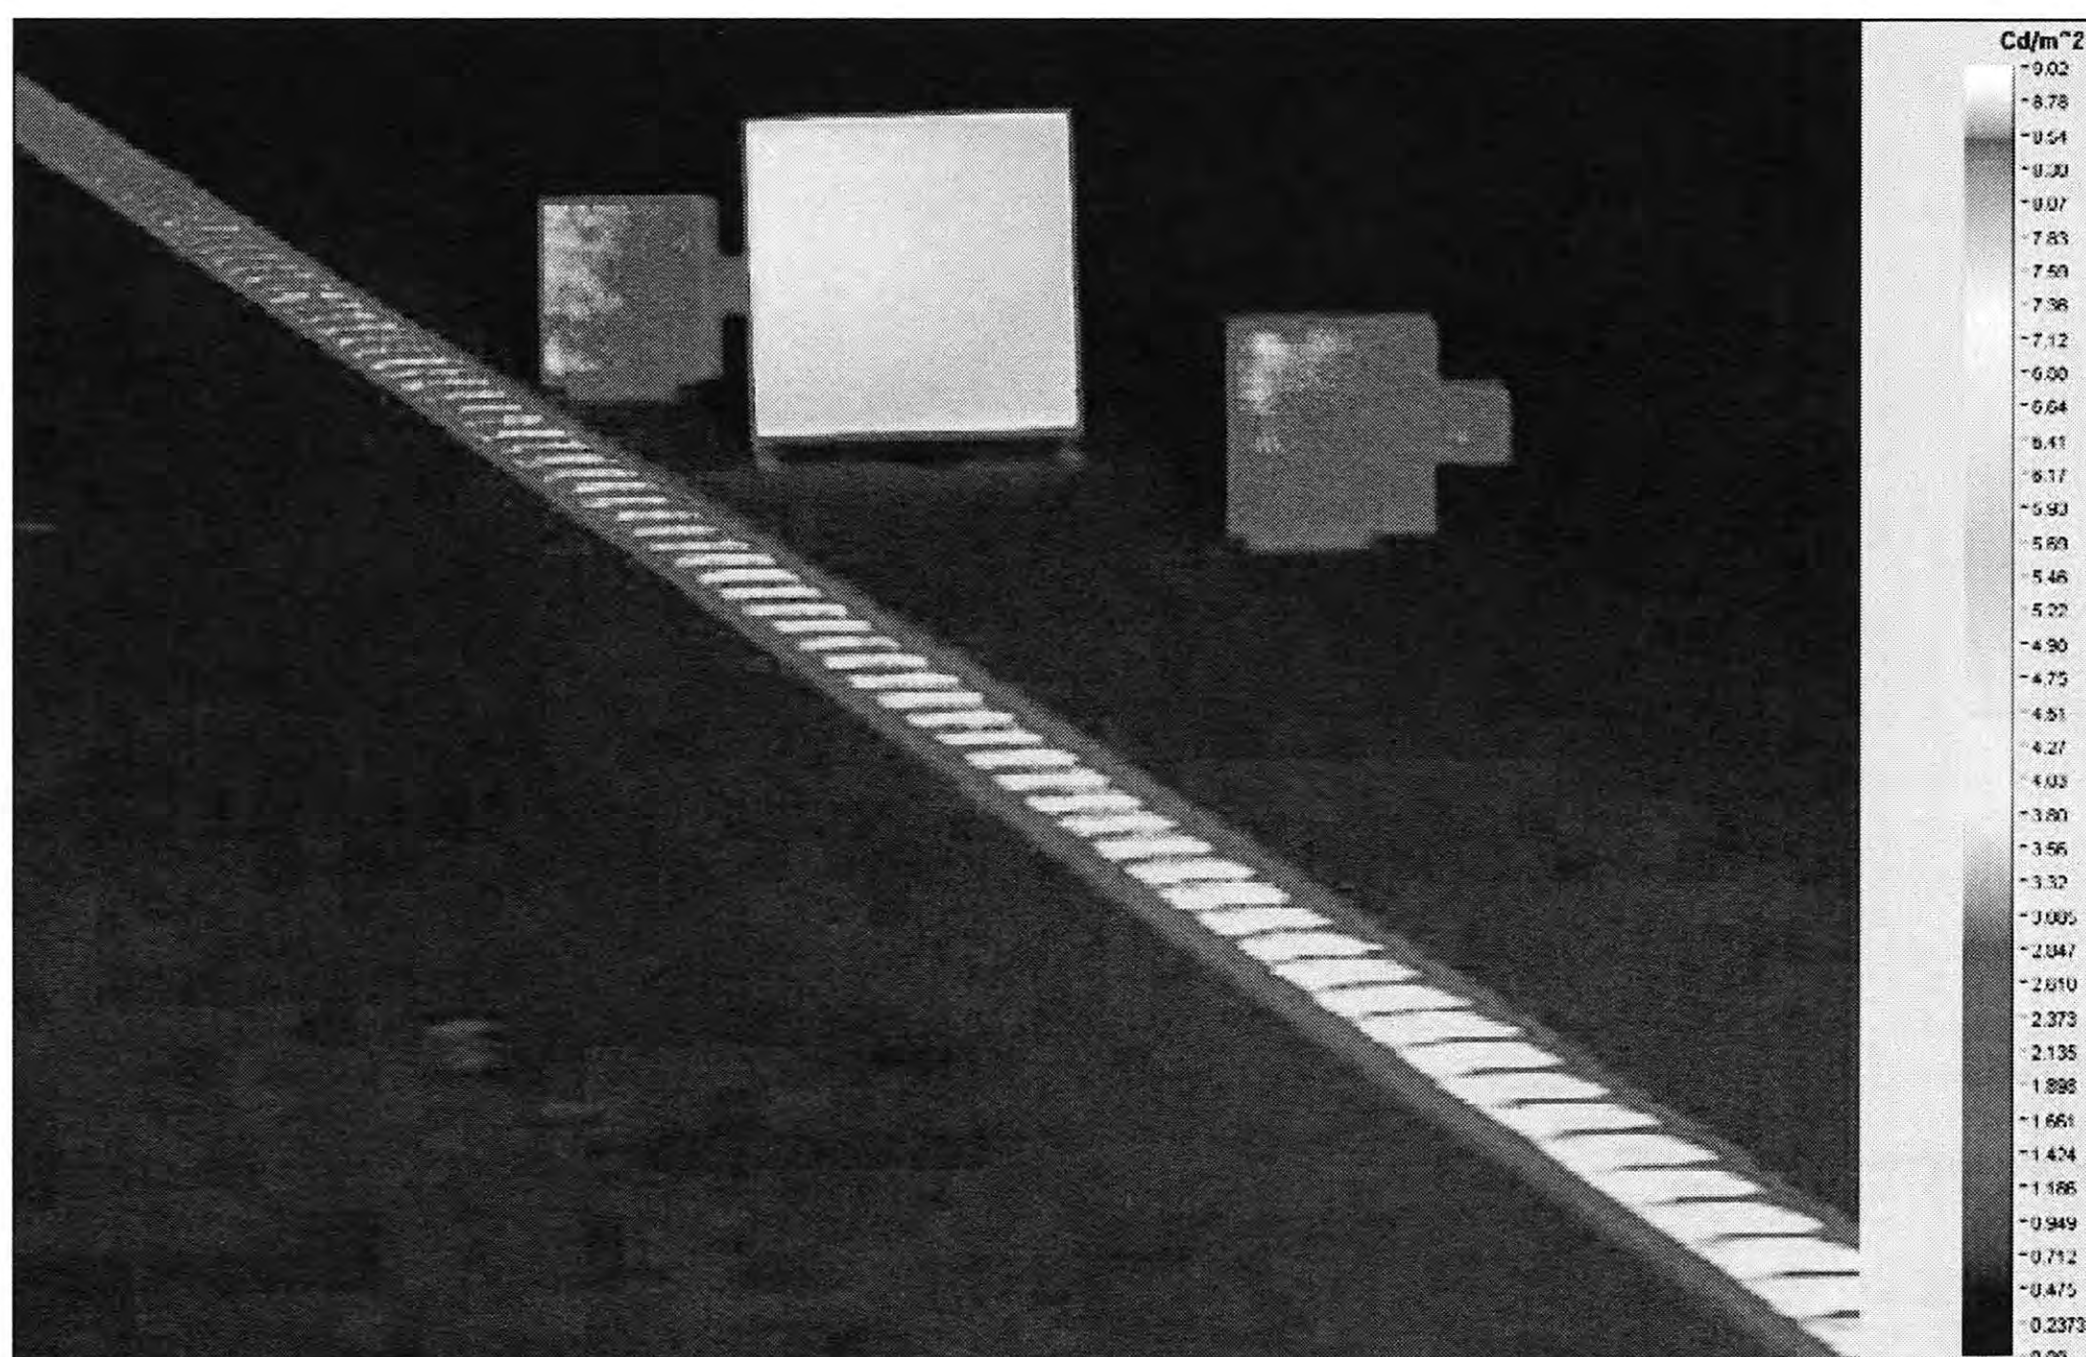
CCD Photometer Image of Profiled Pavement Marking.
